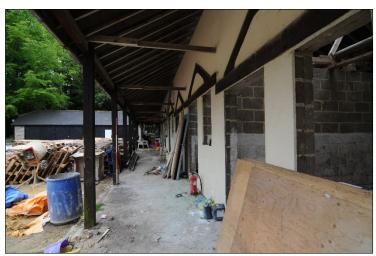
South-west elevation of stable block with timber-framed barn in background
